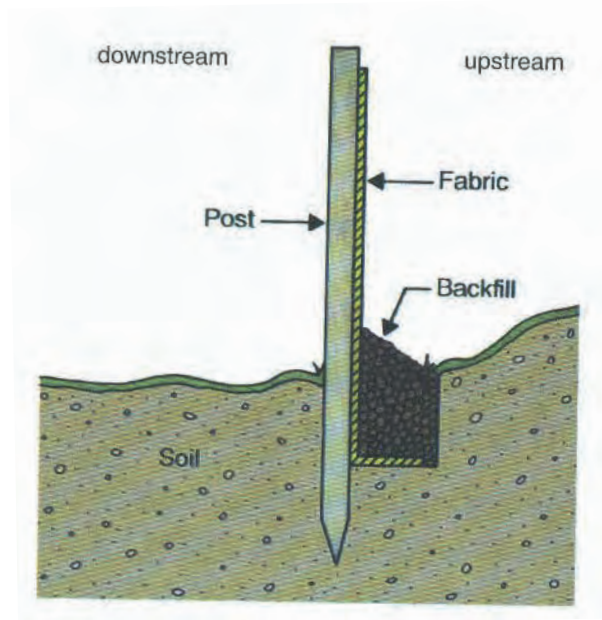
Filter fabric should be embedded in the ditch bottom and sides. Fabric should be supported by wooden posts/stakes.
